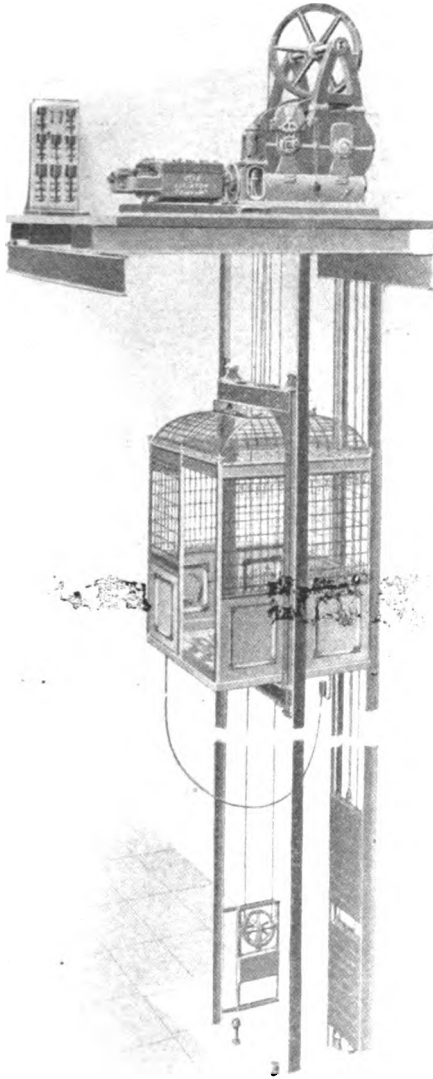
Electric Elevator with Overhead Driving Mechanism.
